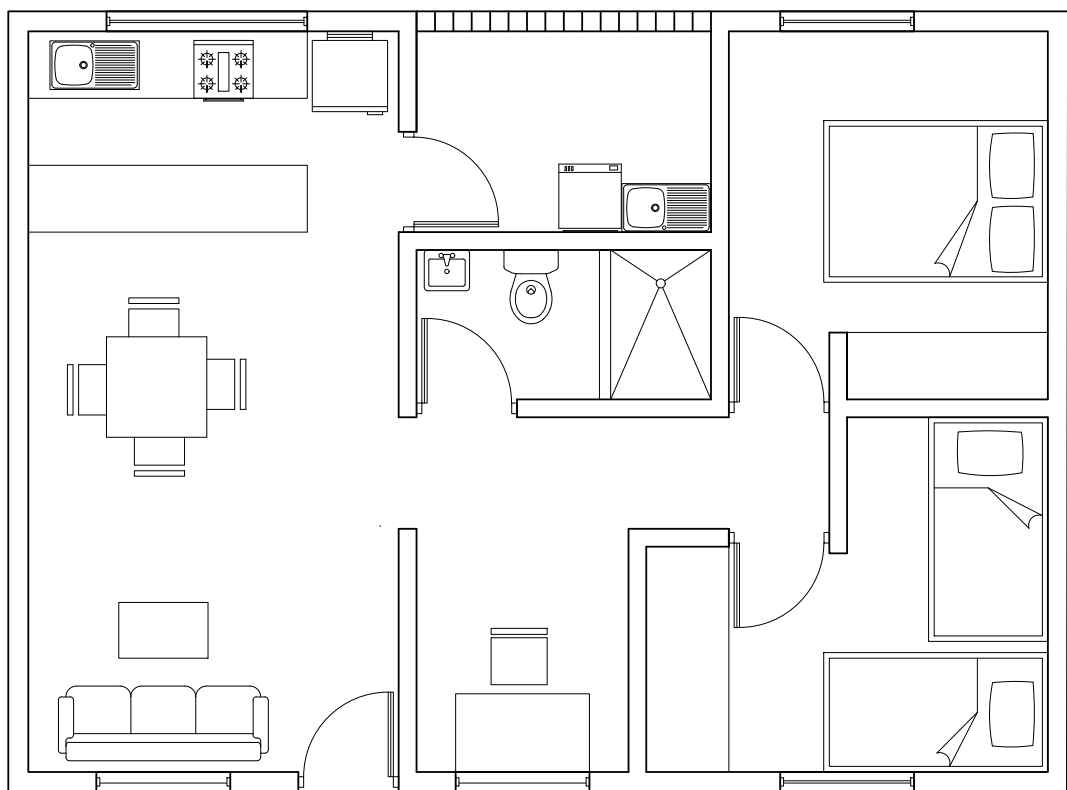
Floor Plan (60 m2) Diagram, Rio Bravo Housing Development (Elaborated by author)
